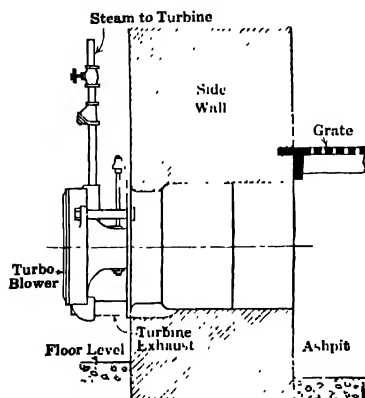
Typical Forced-draft Equipment. Hand-fired Boiler.
